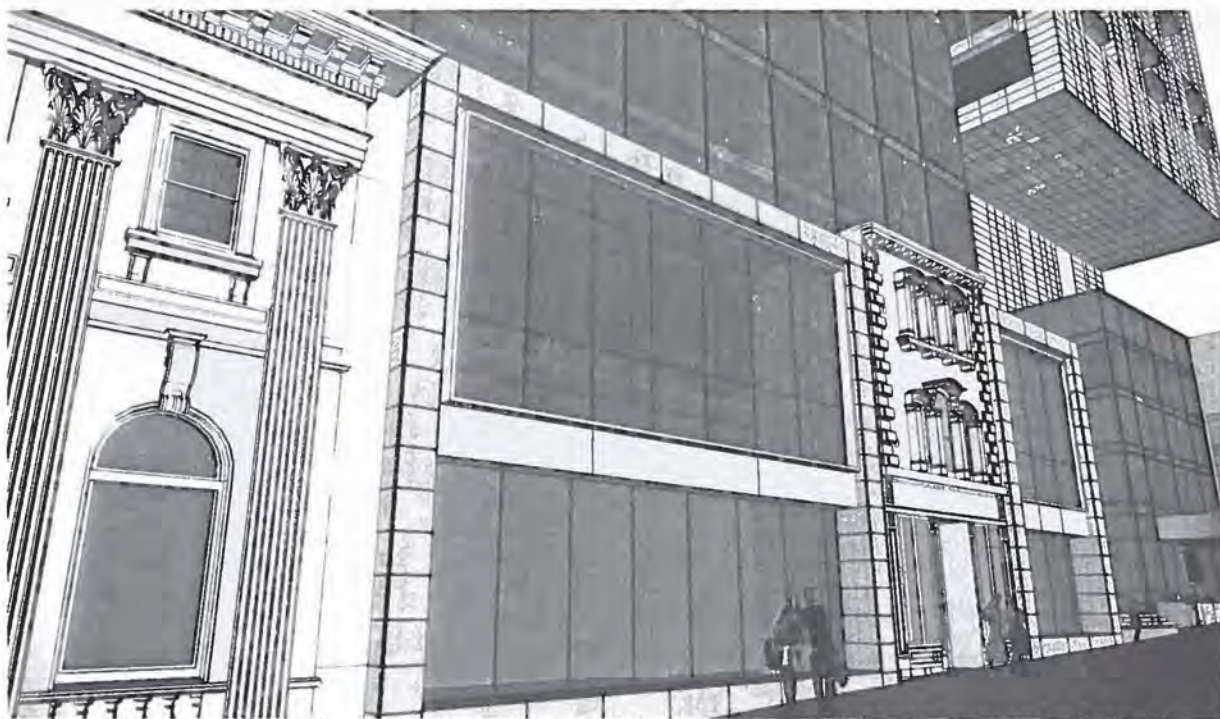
The conserved Merchant Bank and Hayes Insurance Buildings with new infill facades along Granville Street.
